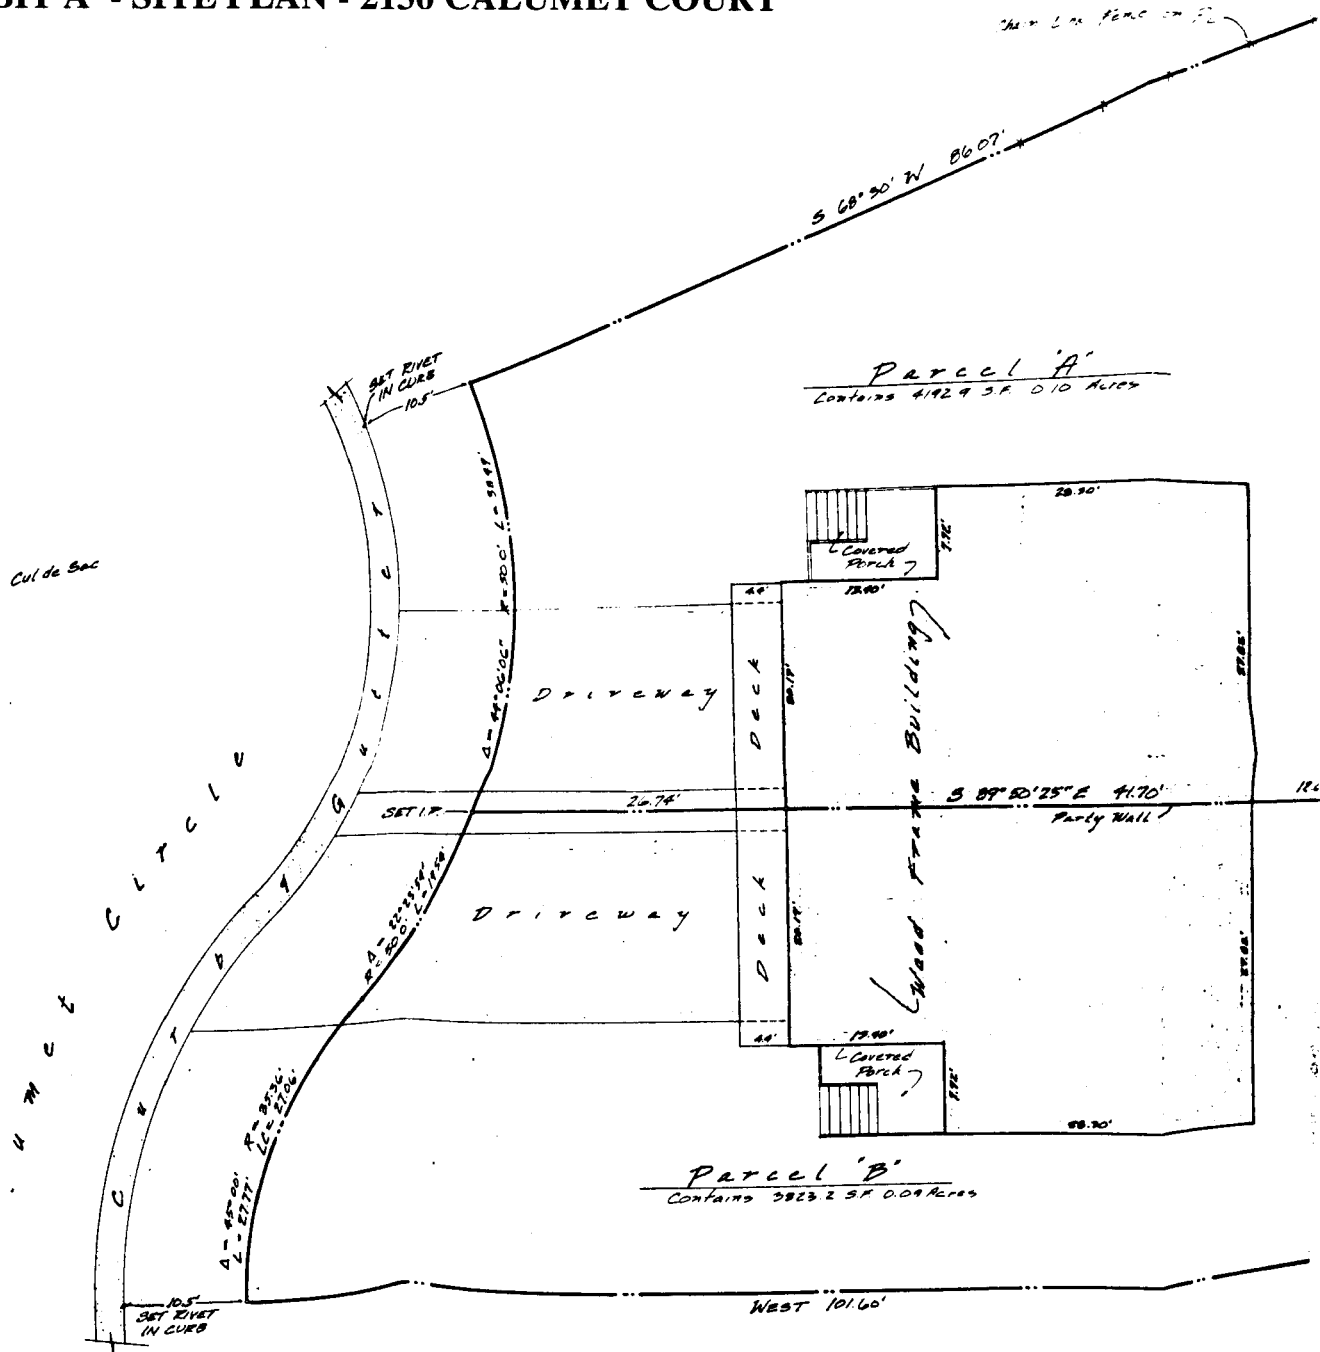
EXHIBIT A - SITE PLAN - 2136 CALUMET COURT
